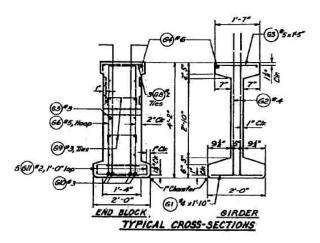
Bridge 512/19 Girder Detail
